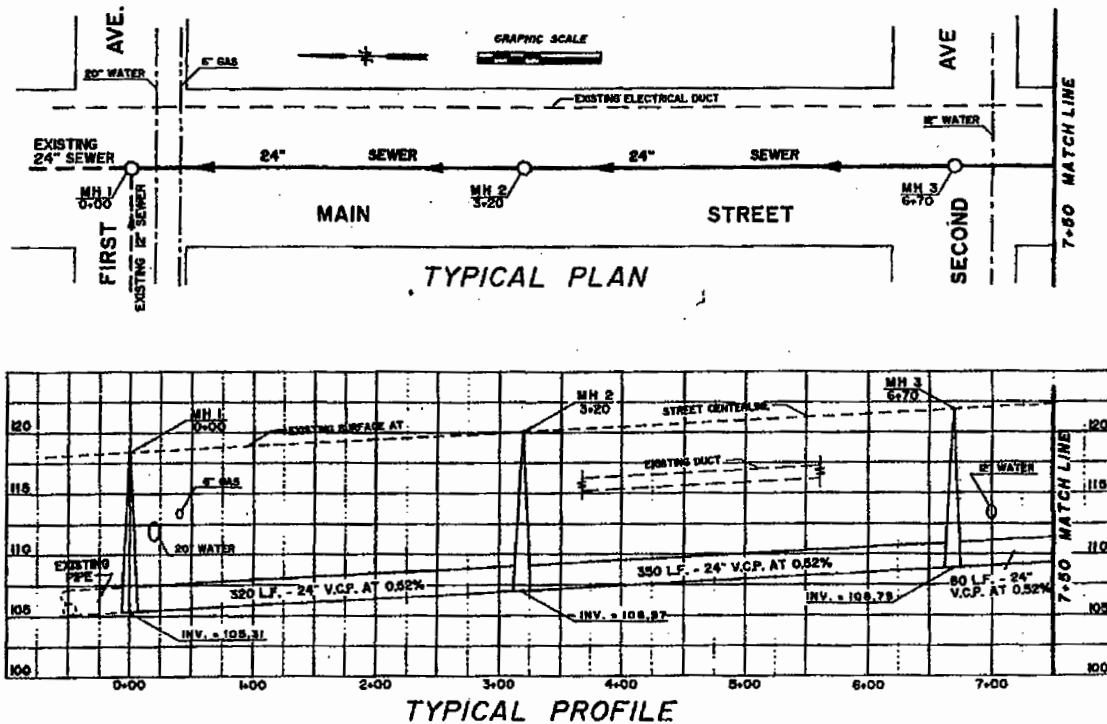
Typical Plan and Profile Drawings for Sanitary Sewer. 1 ft = 0.3048 m (from Ref. 7; used with permission of National Clay Pipe Institute).
